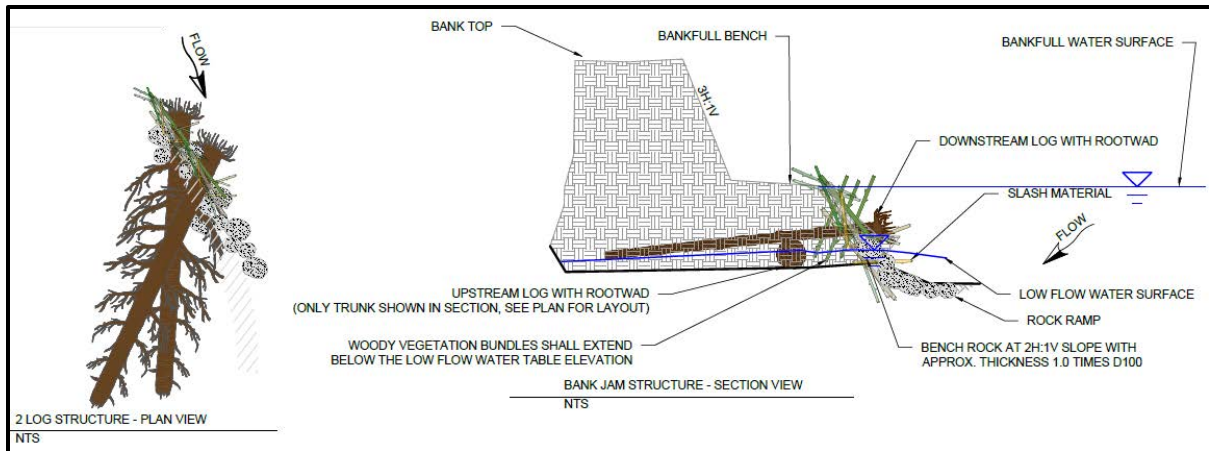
Cross-sectional diagram of proposed bankfull bench and stabilization methods
